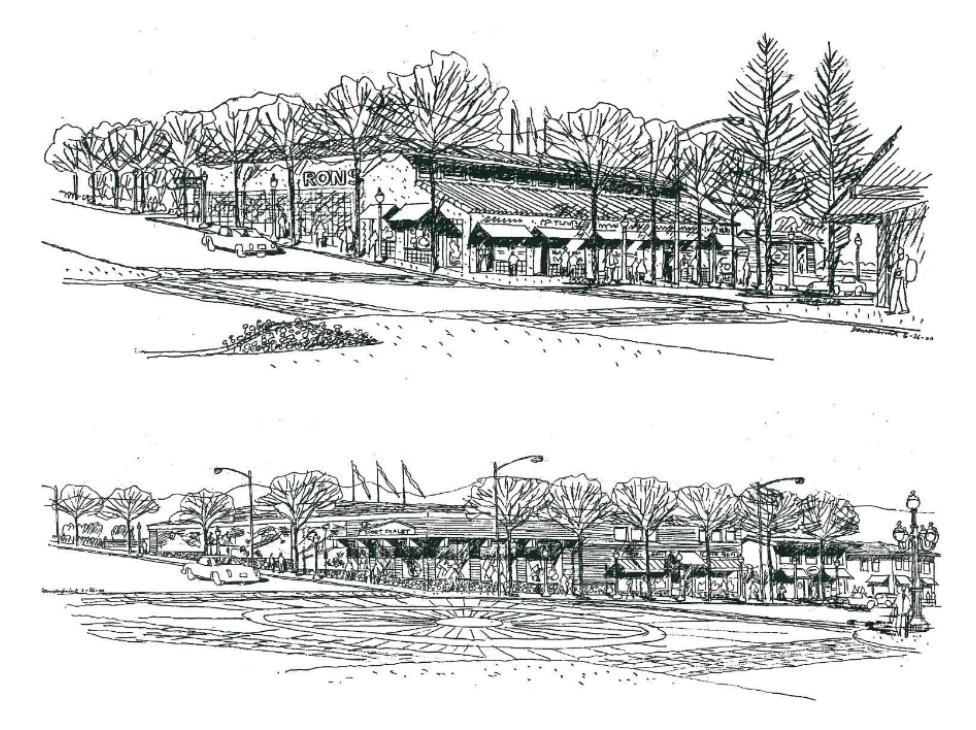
Conceptual Illustrative Plan for the Village Center
